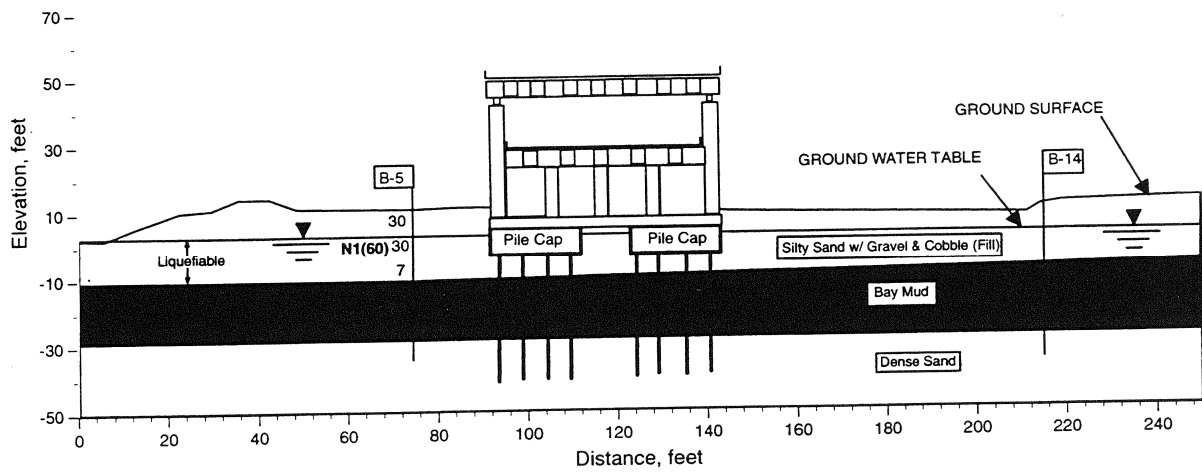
San Francisco - Oakland Bay Bridge east approach cross section (typical).
